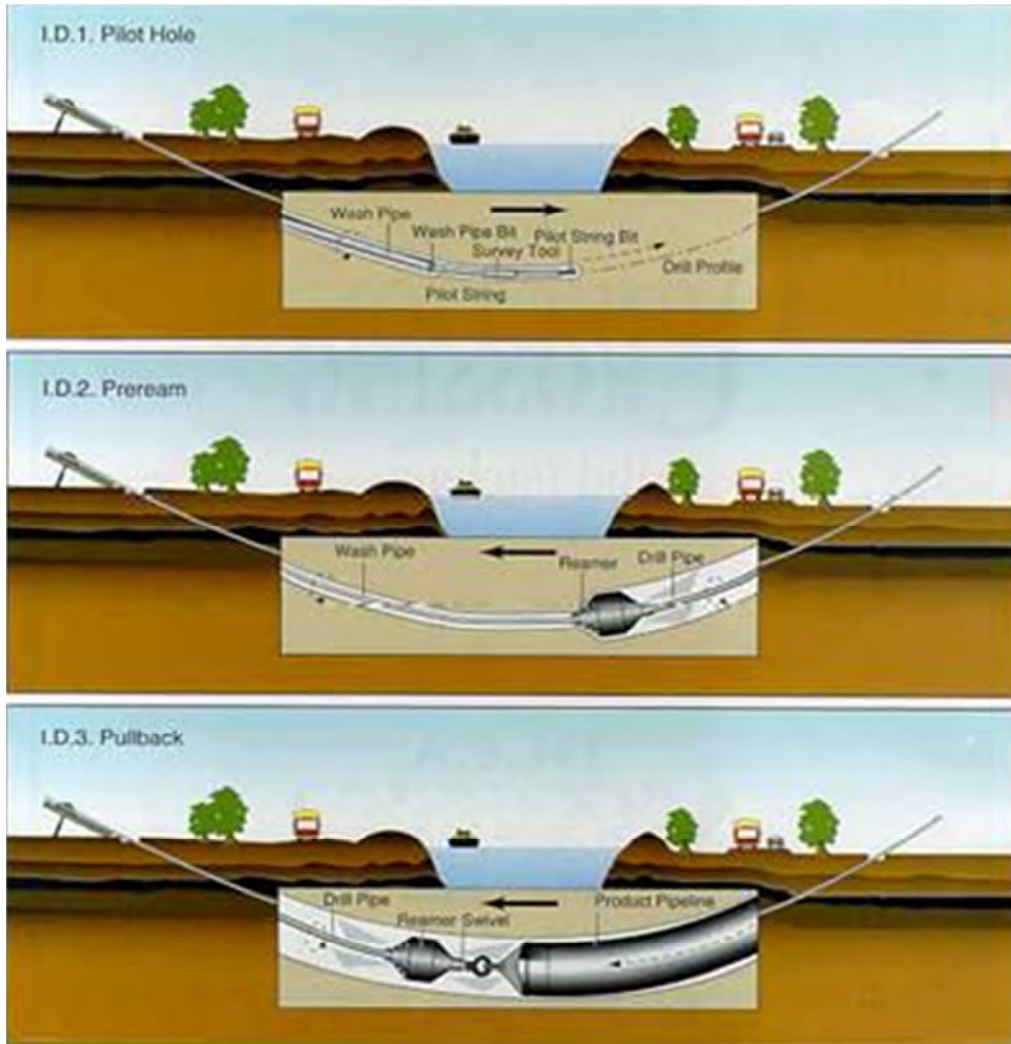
Pipe Installation Under Water Using Horizontal Directional Drilling (Apollo Trenchless Inc., 2013)
